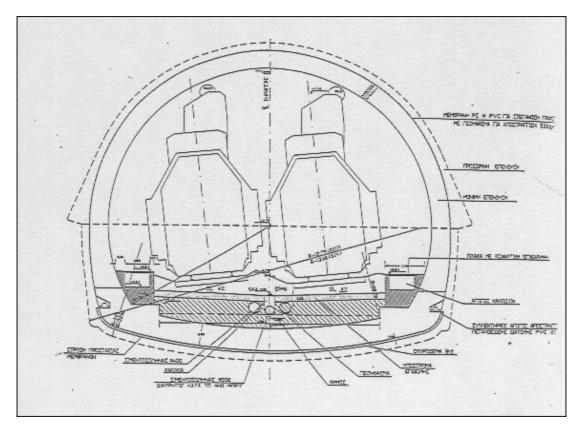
TYPICAL CROSS SECTION OF THE TUNNEL
